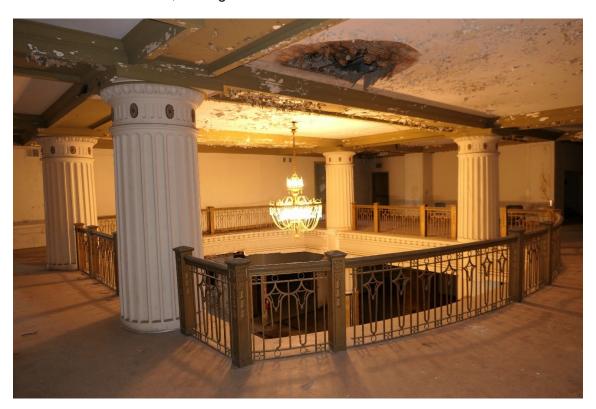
Second floor/mezzanine, former XIT Room, looking east.
